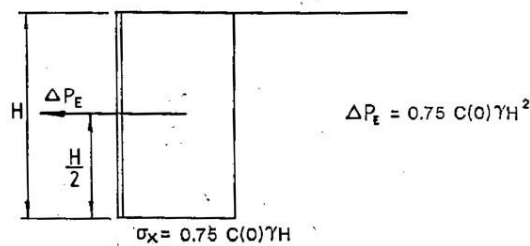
Earthquake Pressure Increment on a Stiff Wall
